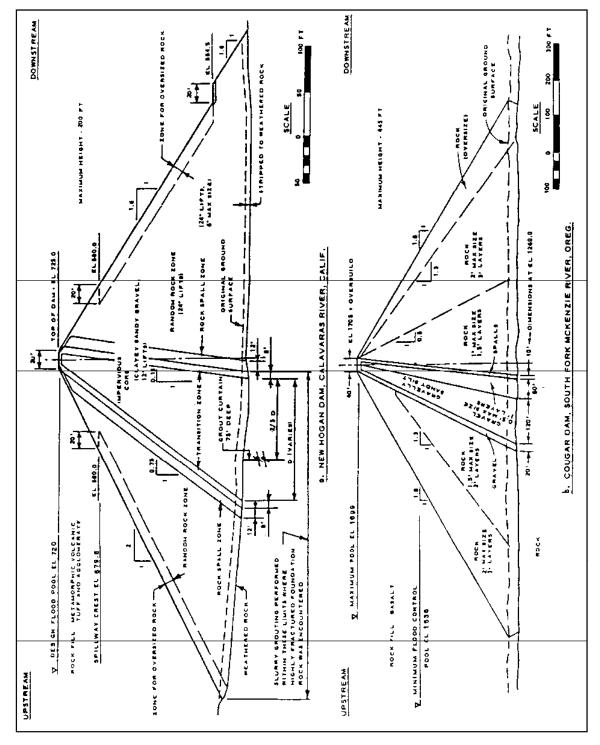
Embankment sections, rock-fill dams (New Hogan and Cougar Dams)
